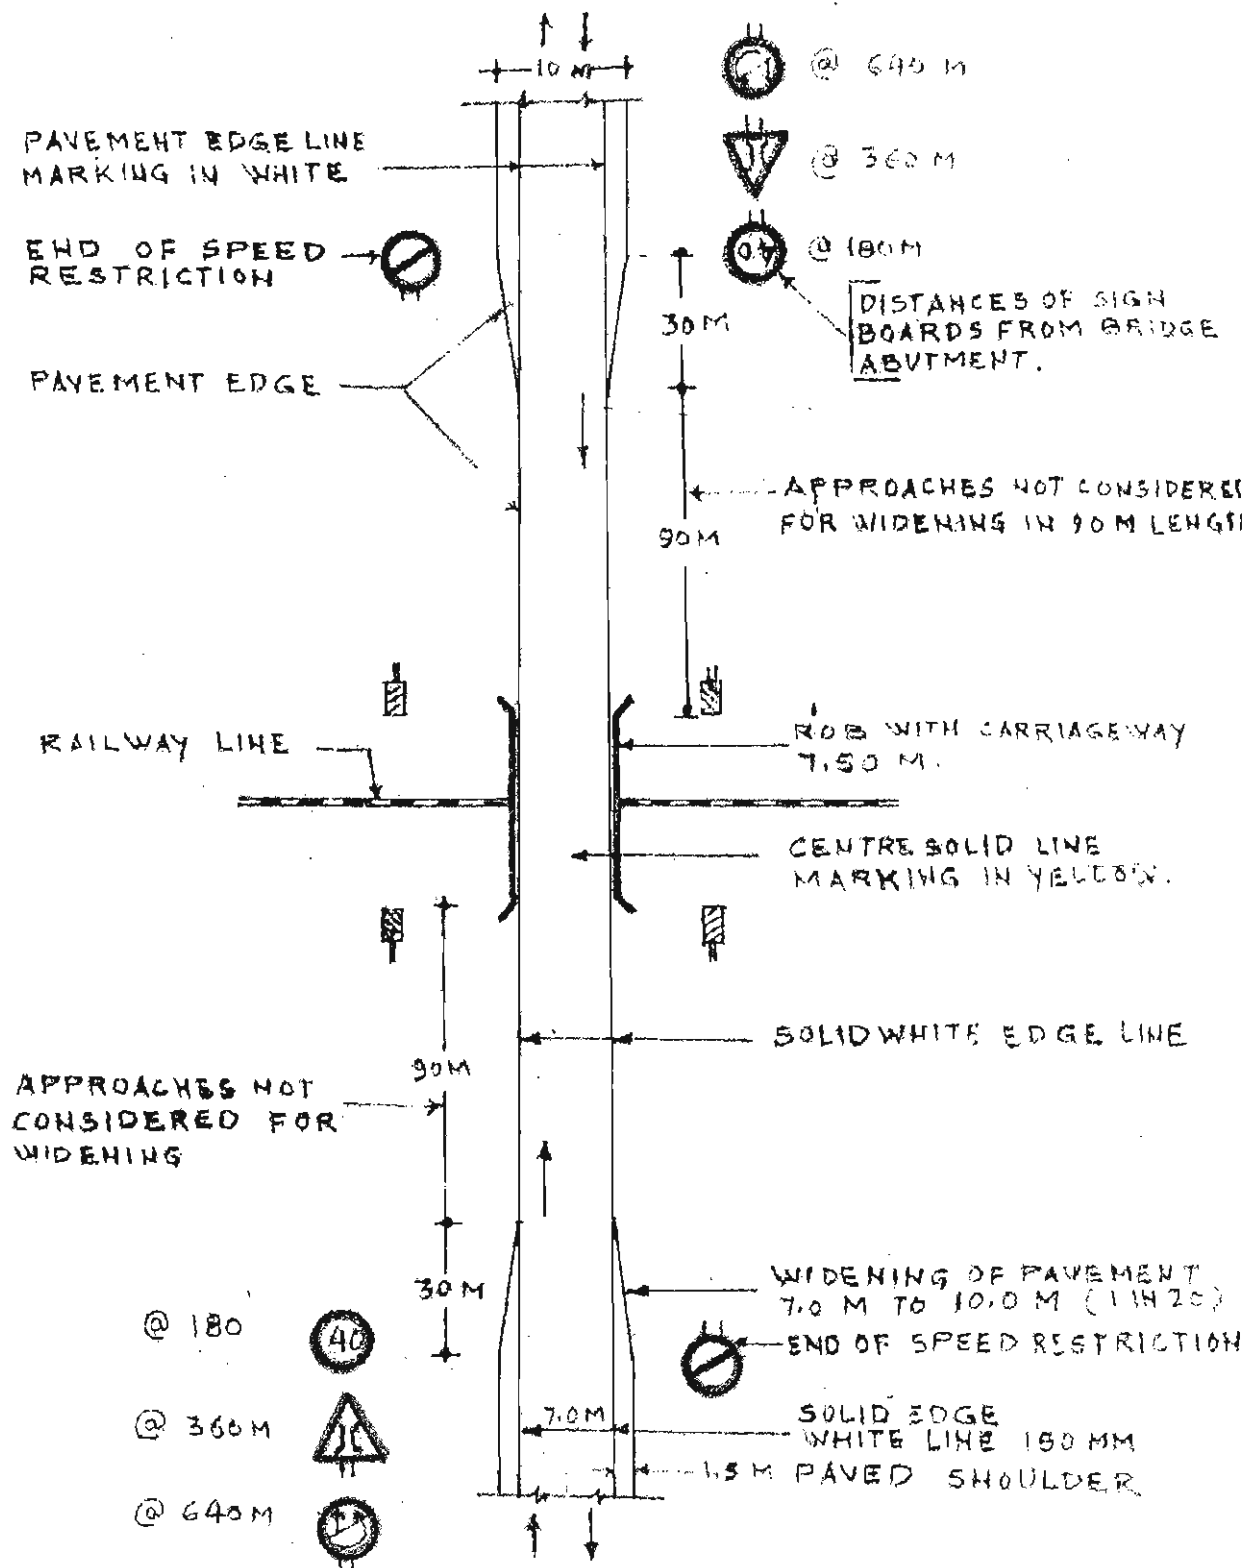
Approaches at Existing Narrow Road over Bridges (ROB's)
